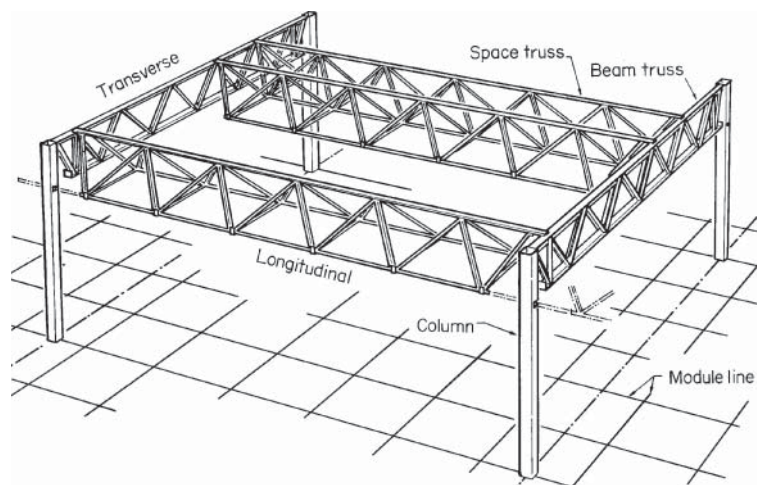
Cold-formed steel members used in space grid system. Courtesy of Butler Manufacturing Company.
